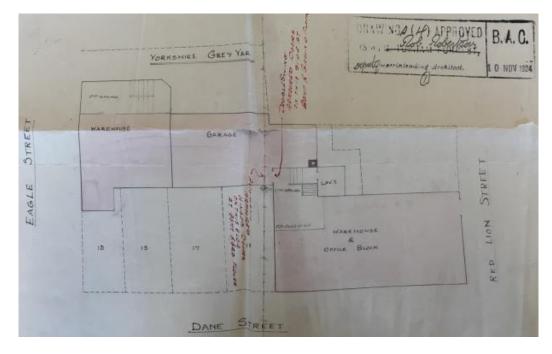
Block Plan of site of Summit House dated 1924¹⁸
